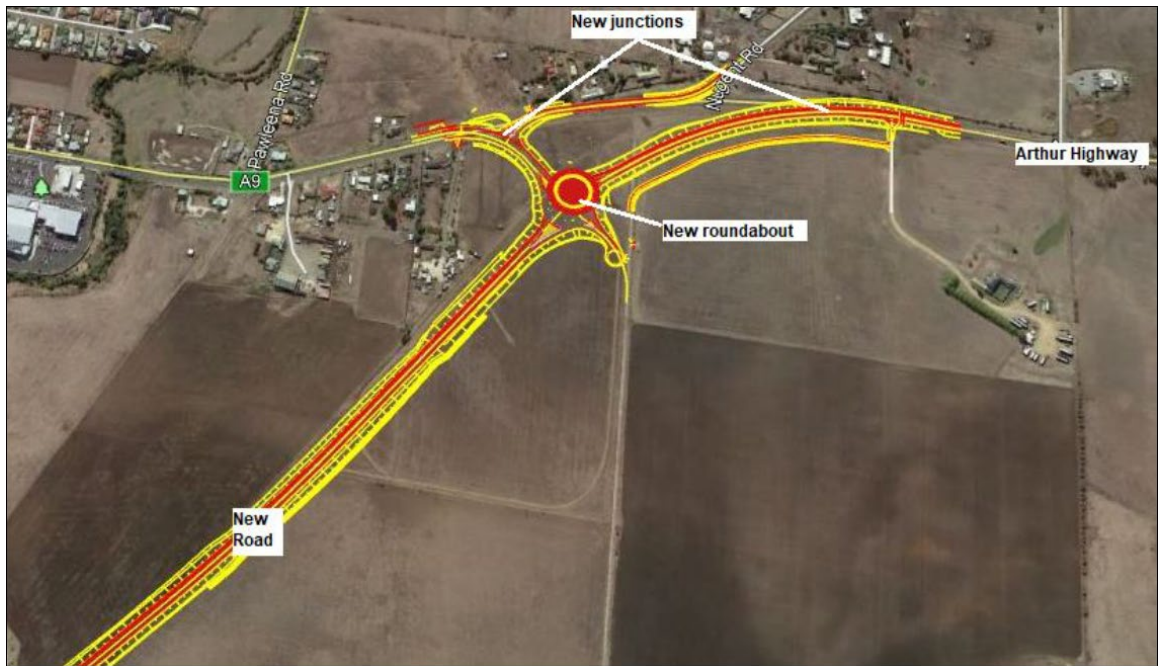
Proposed works include a new roundabout, intersections with Arthur Highway and resurfacing of Arthur Highway and Nugent Road. (Source: planning application documentation)
